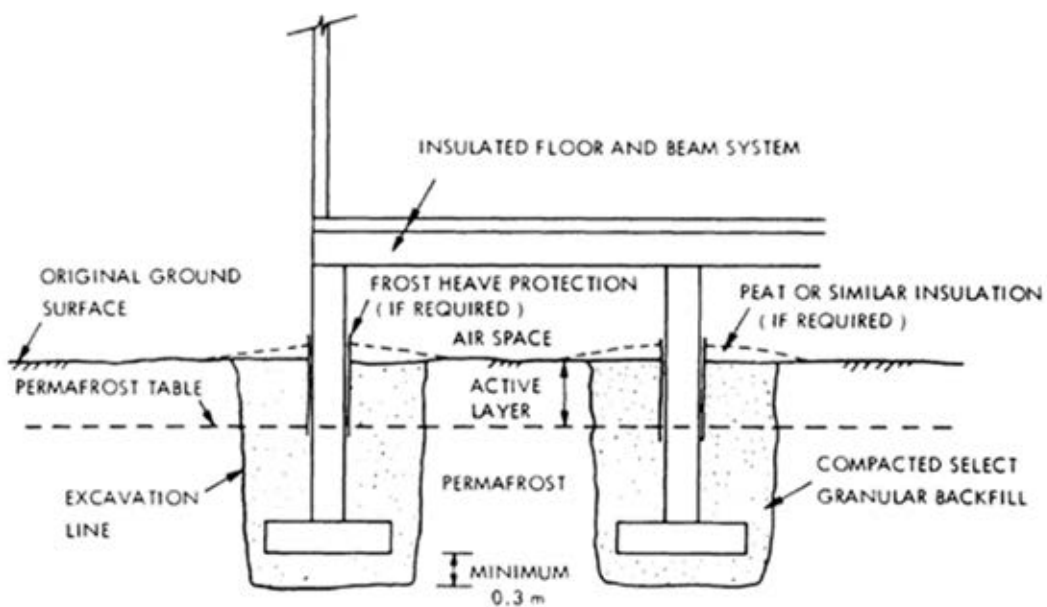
Typical shallow foundation footings in permafrost, placed in backfilled pits excavated below the original ground surface (after Johnston 1981)
